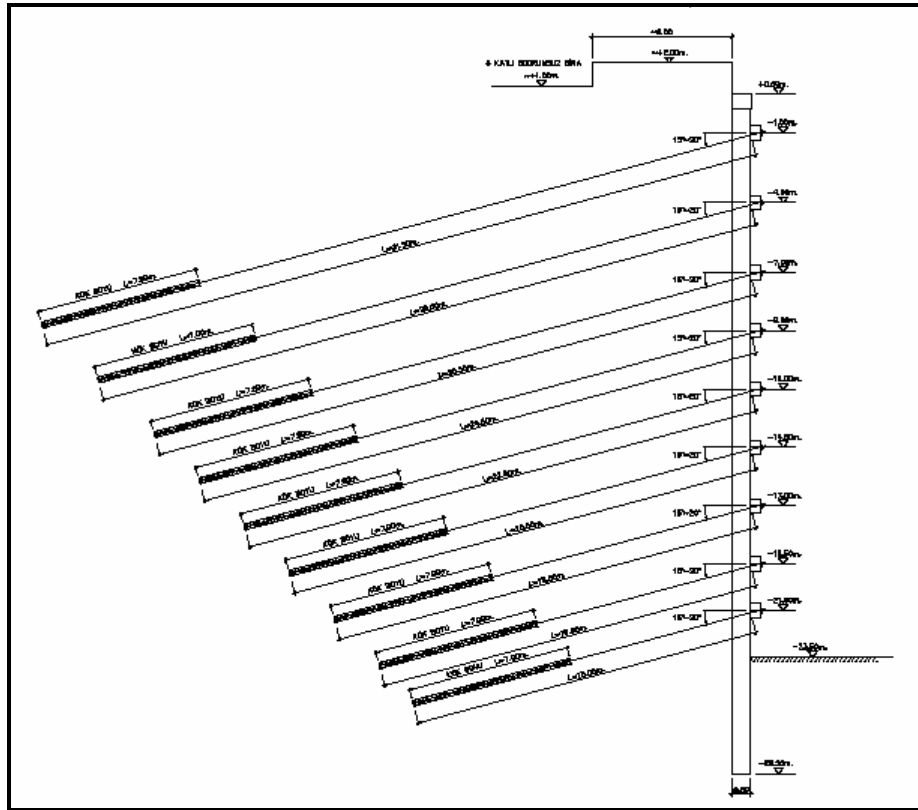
Cross section view of in-situ wall (Çalışan (2005))
